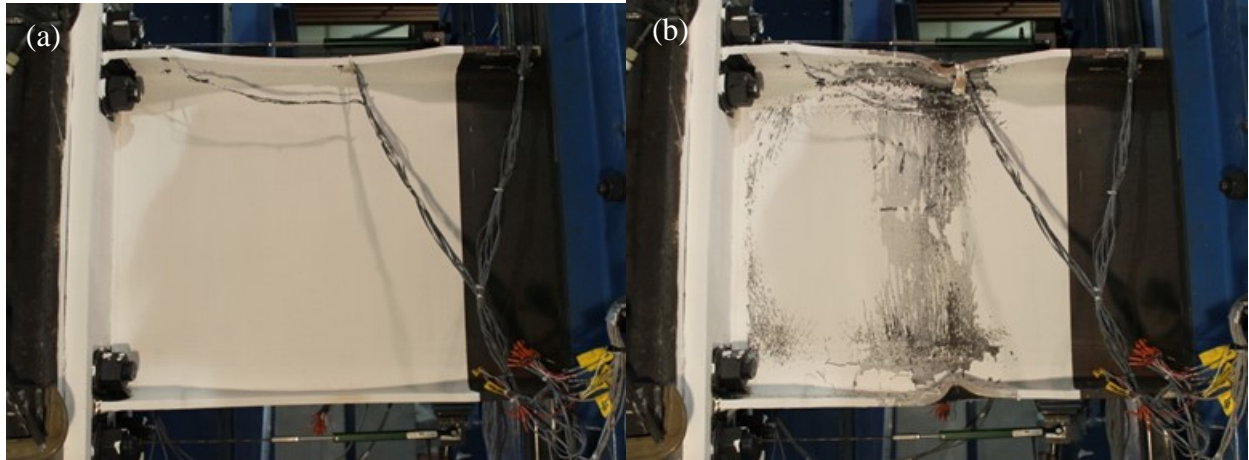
Side View Pictures of Specimen 5 (W24x62 with RBS and Puddle Welds) at (a) Start of Test, and (b) Prior to Fracture
